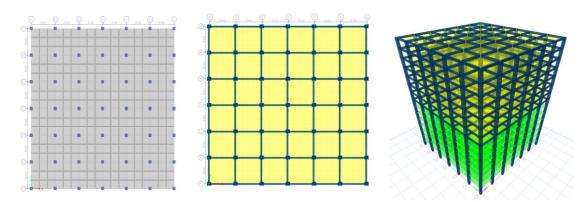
a. Plan view from Ground storey to 7th storey, b. Plan view from 8th storey to 15th storey and c. Elevation view of model GS+CS
